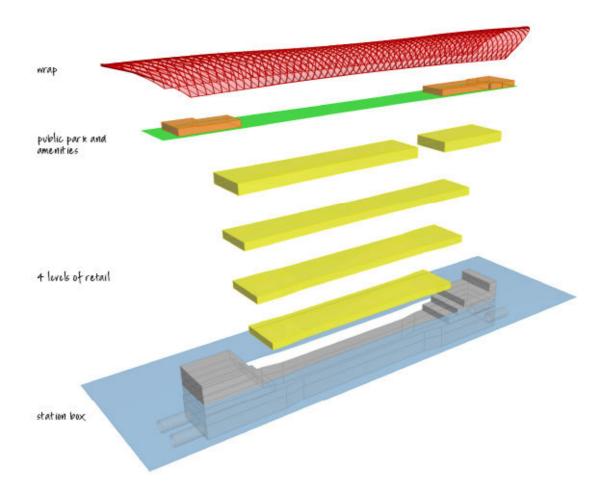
Showing the scope of the proposed over site retail and park development and consented Isle of Dogs Crossrail Station below.
